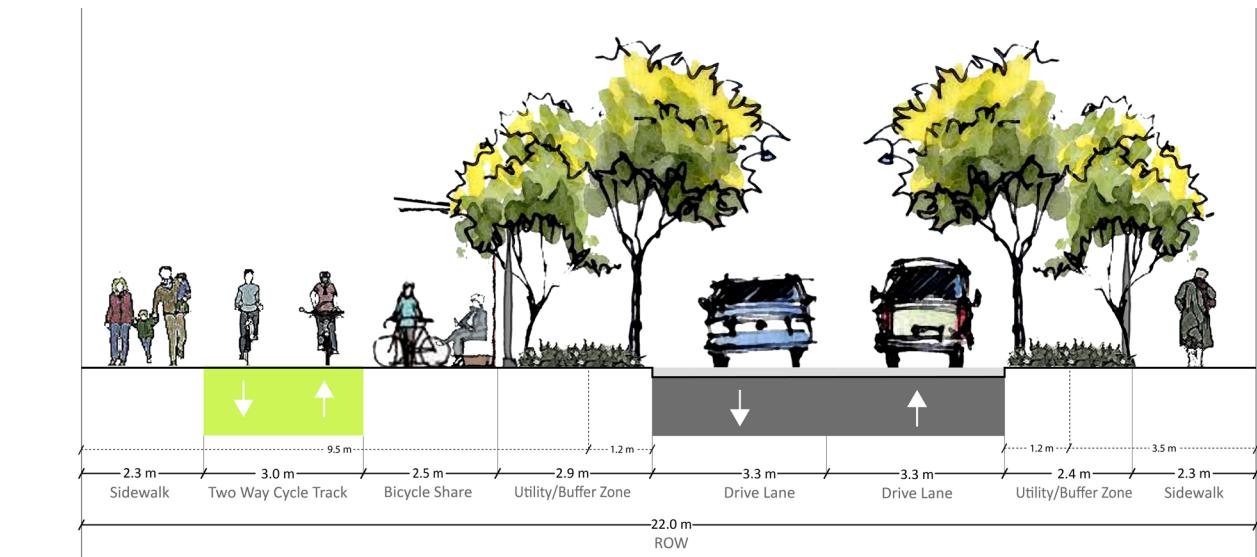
Kapyong Minor Collector Street Section with a Bike Share Station
